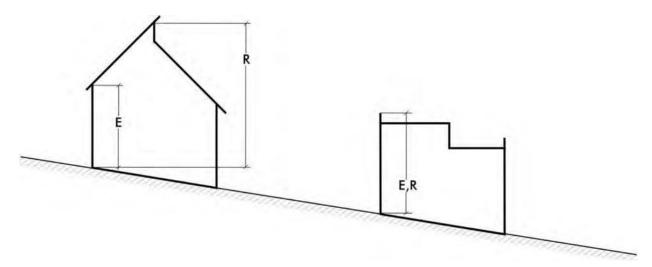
Eaves and roof ridge heights (source Urban Regulatory Plan Mati I-2005, pg.77).
